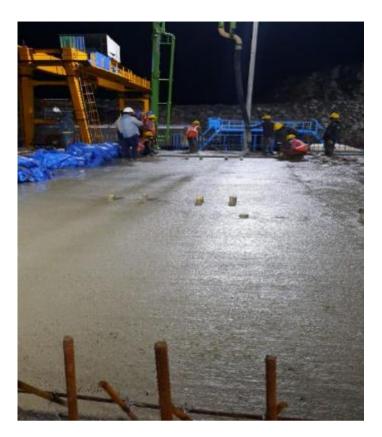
Segment concrete pouring at bay 2, precast yard in progress
